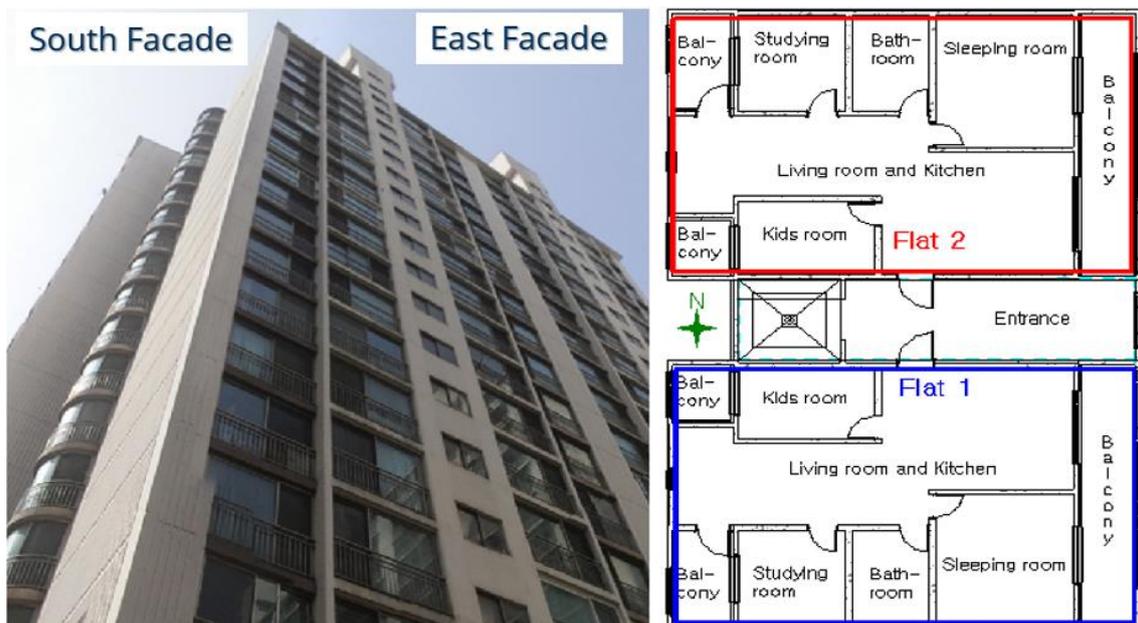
Korean Multi-family House and Floor Plan [28] [29]
